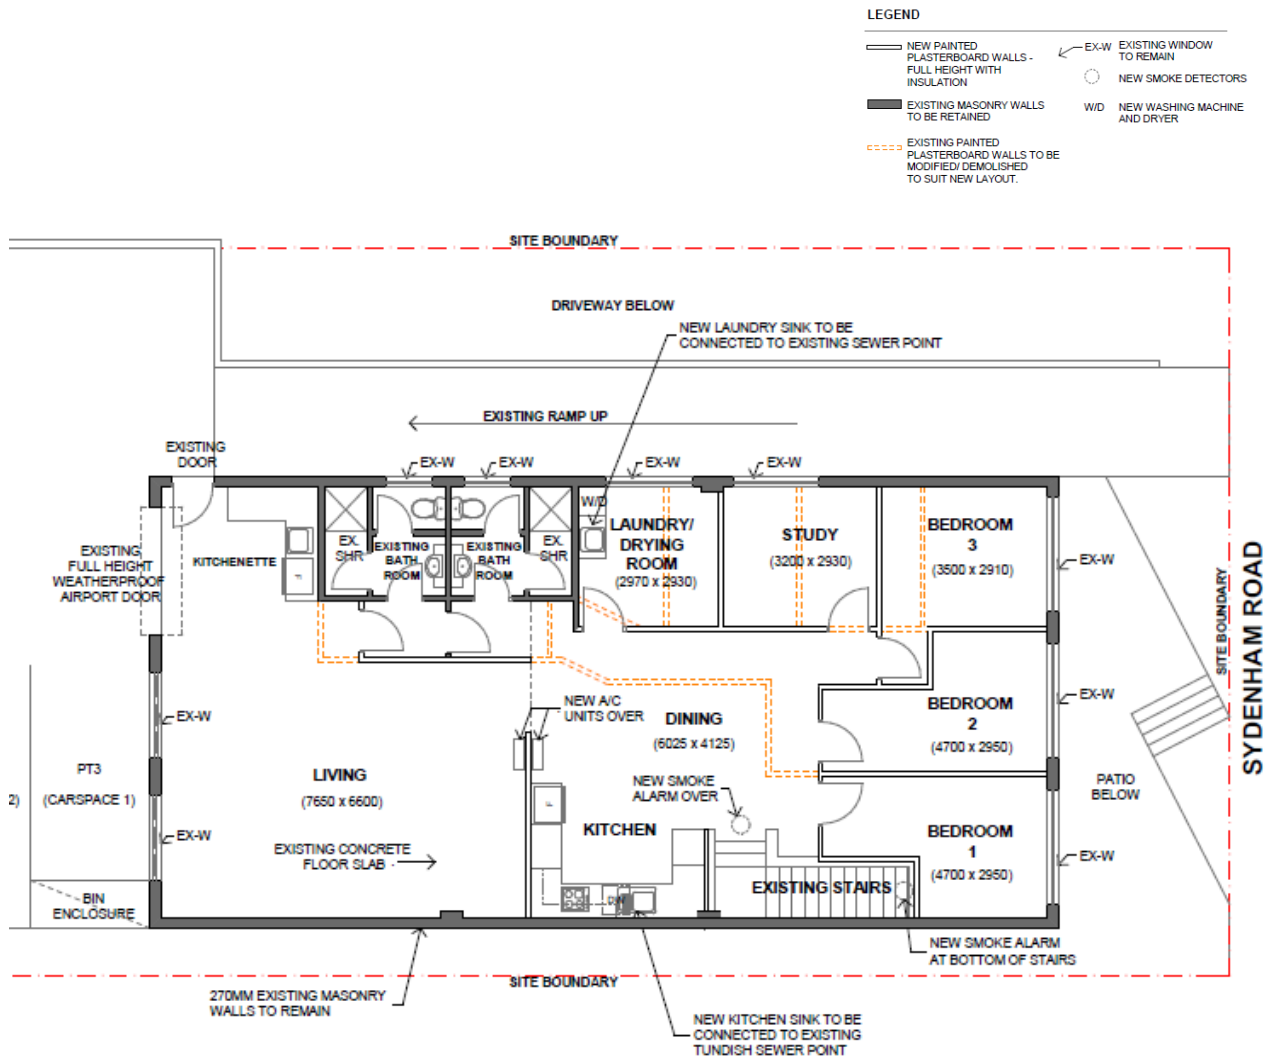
Proposed First Floor Plan (Nicole Sellin Design 2020)
